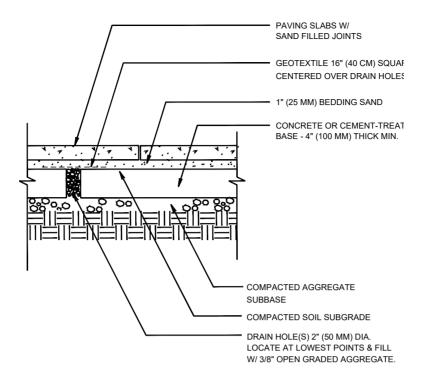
Typical cross section of sand-set paving slabs on a concrete base
